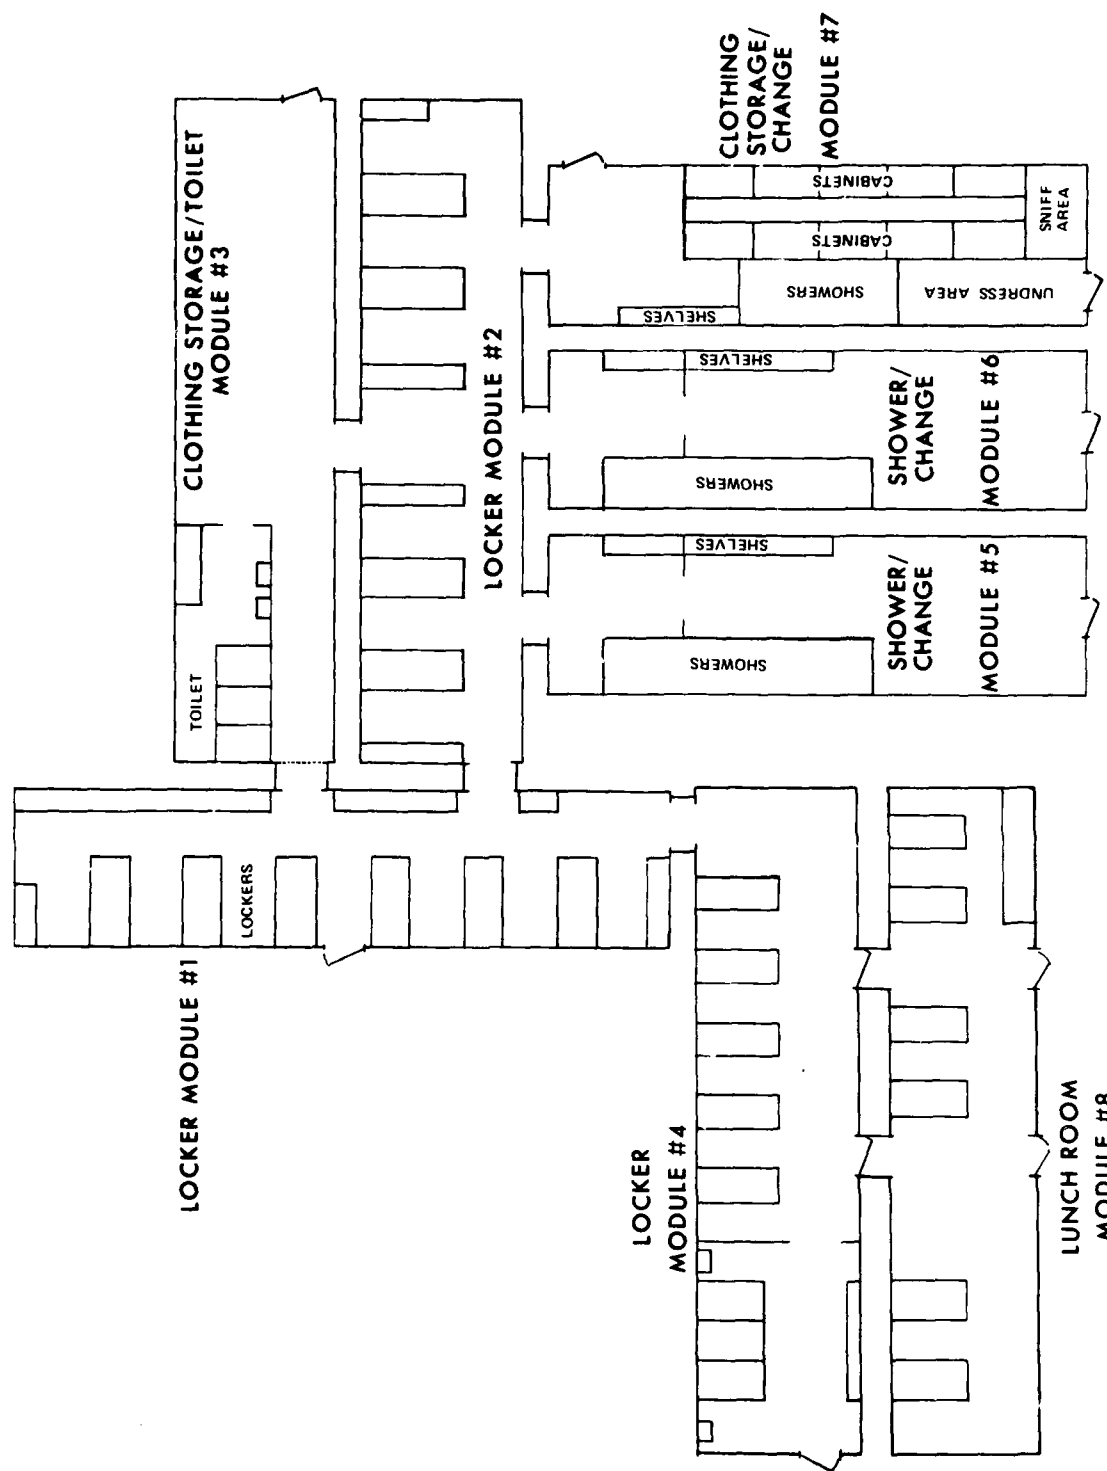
FLOOR PLAN OF THE PERSONNEL SUPPORT COMPLEX
